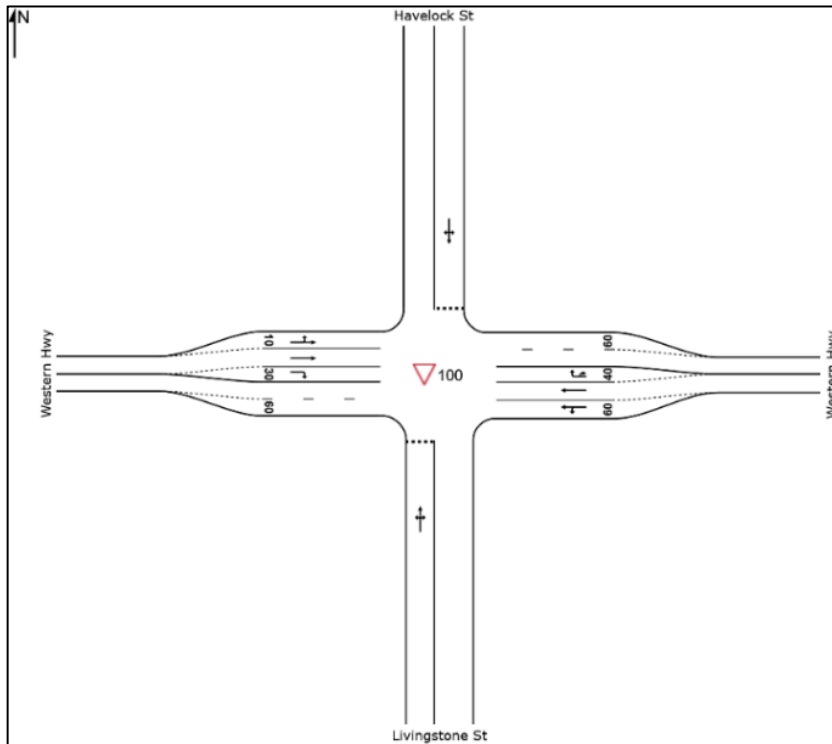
Intersection layout for Western Highway, Havelock Street and Livingstone Street
